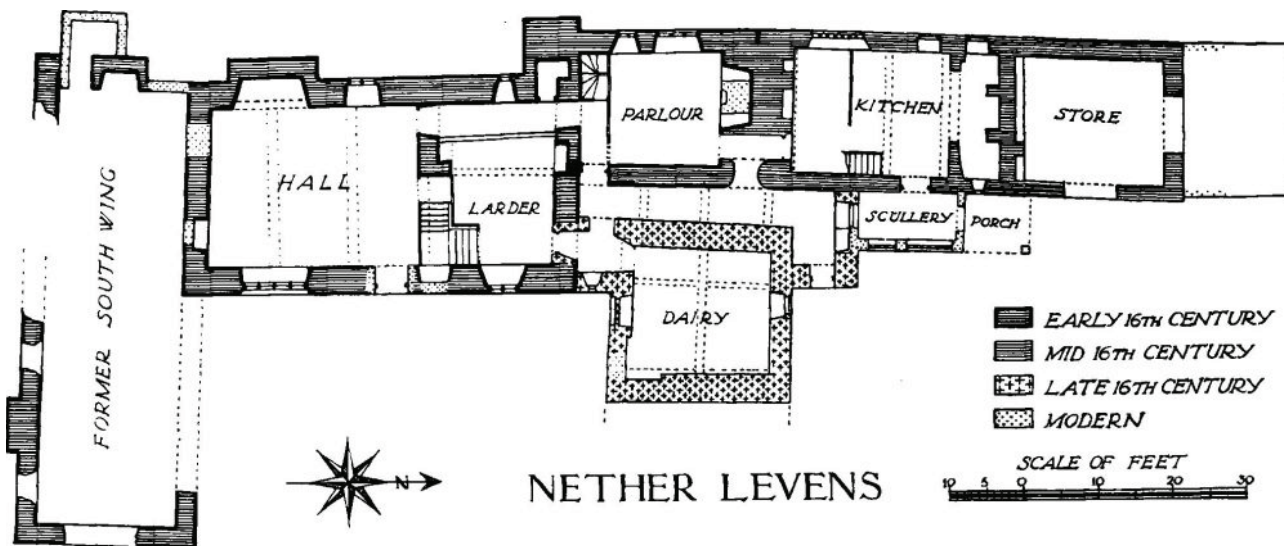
Plan showing the development of Nether Levens Hall (after RCHME 1936)
